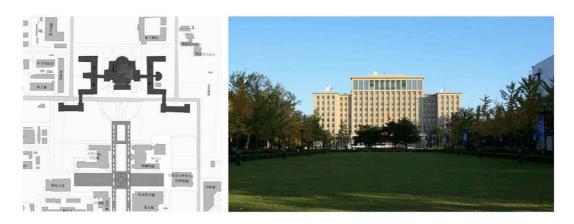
The Site Plan of the Main Building of Tsinghua University
